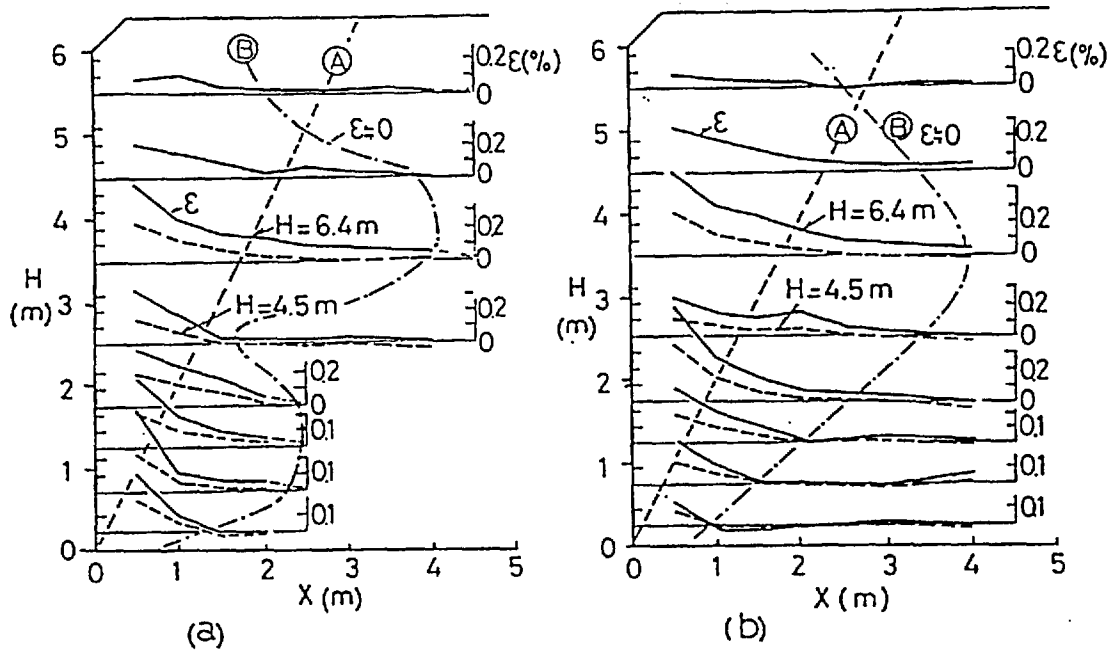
Strain distribution of polymer grids during constructing prototype test wall, (A) potential failure plane in active state, (B) locus of zero-strain in reinforcements (after Yamanouchi *et al.* 1986b). (a) reinforcement length 4.5 and 2.5 m, (b) reinforcement length 4.5 m
